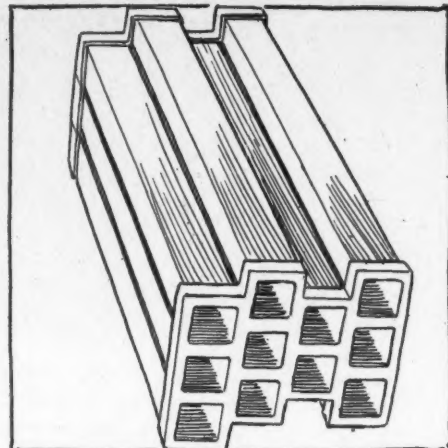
LOCKPORT STAGGARD TYPE RADIATOR
